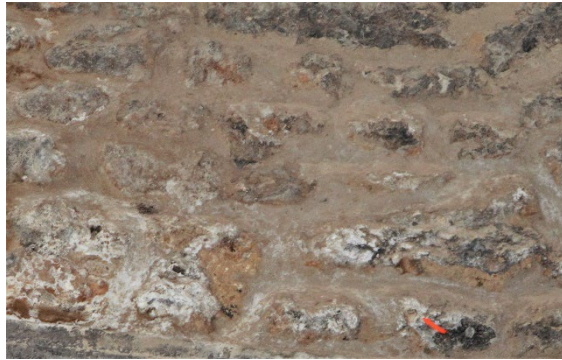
Salt efflorescence, rubble stone wall, vault zone, interior cella, Water Temple
